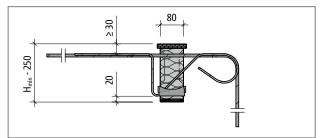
Schöck Isokorb® T type K-WU: Product section
